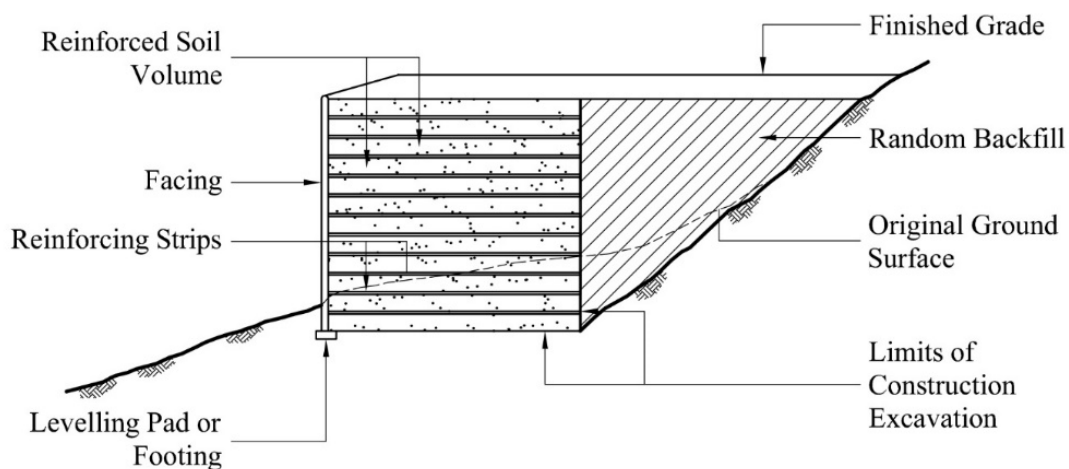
Principle elements of reinforced wall (adapted from Christopher et al., 1989)
